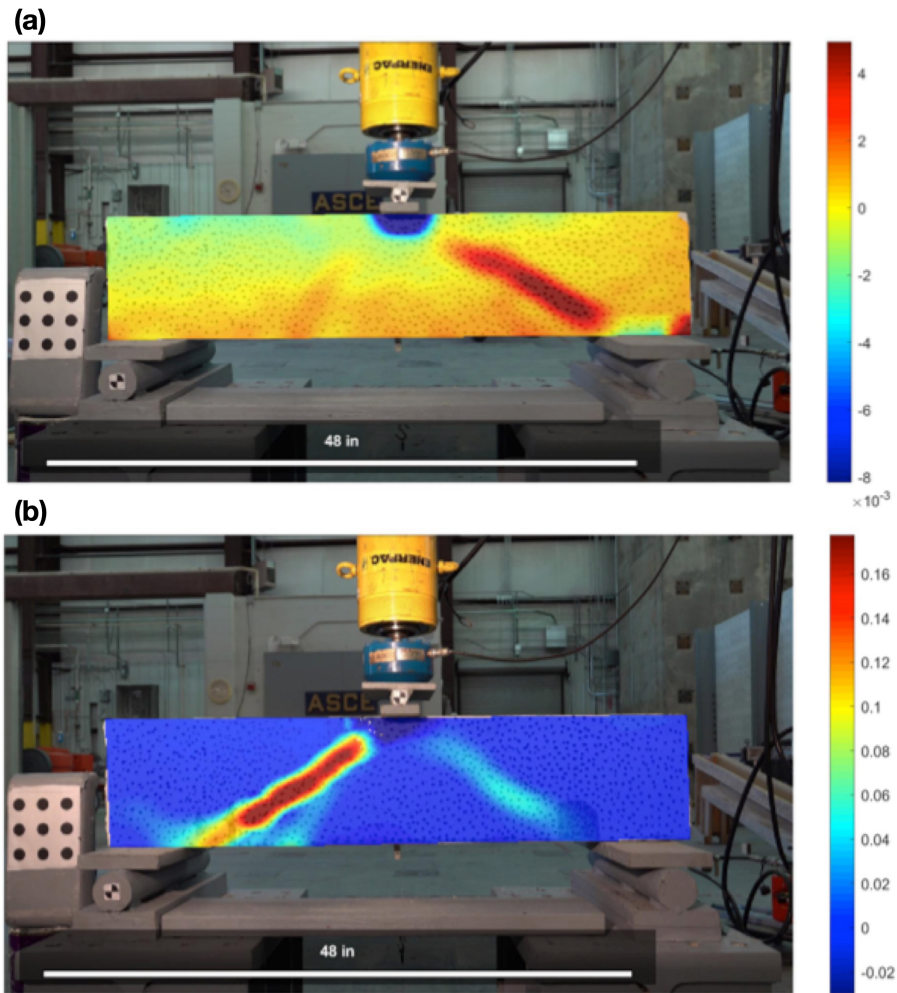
Behavior of epoxy-repaired reinforced concrete beam via DIC: (a) at major crack development; (b) at failure. Values in inches.
